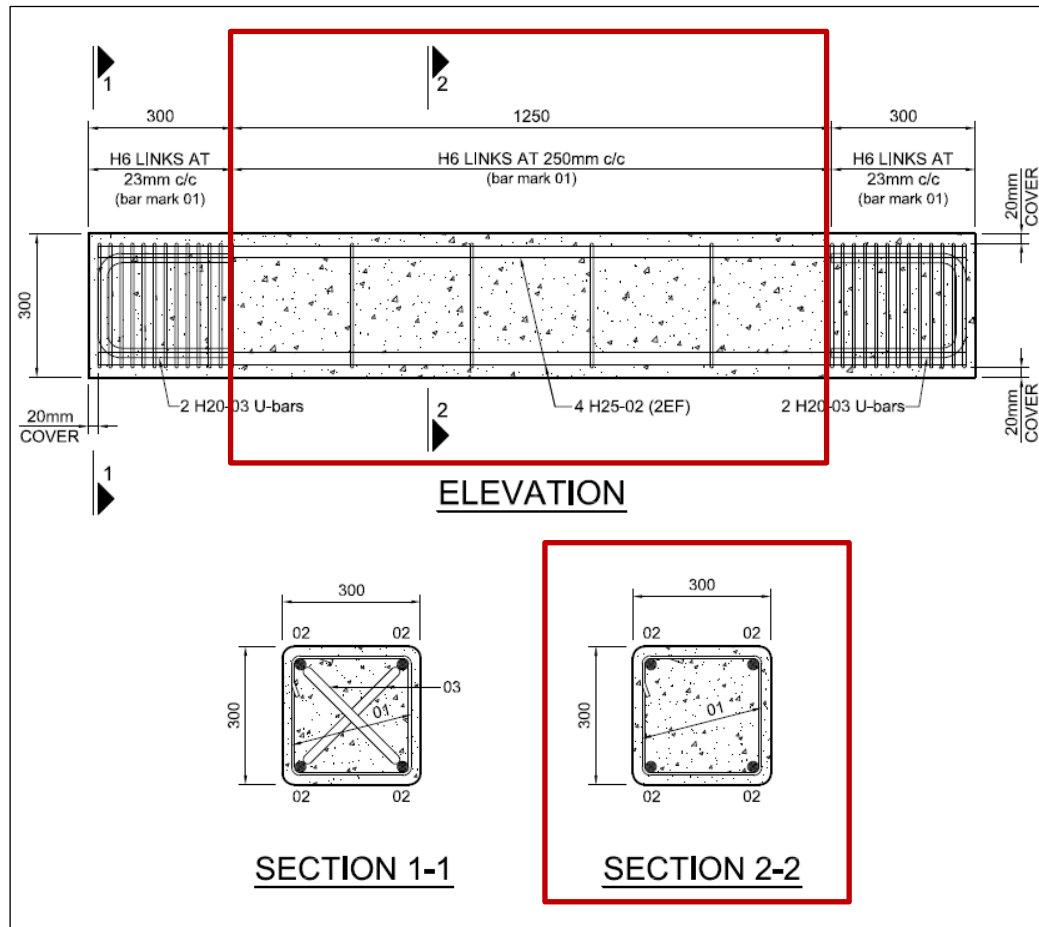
Medium-scale control specimen – Straight column (loading profile concentric and ECC1), red boxes highlighting test area with minimal reinforcement
